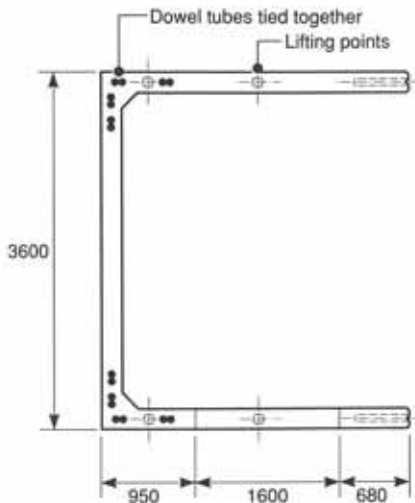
TYPICAL HORIZONTAL JOINT DETAIL USED IN THE ST GEORGE HOSPITAL PROJECT
